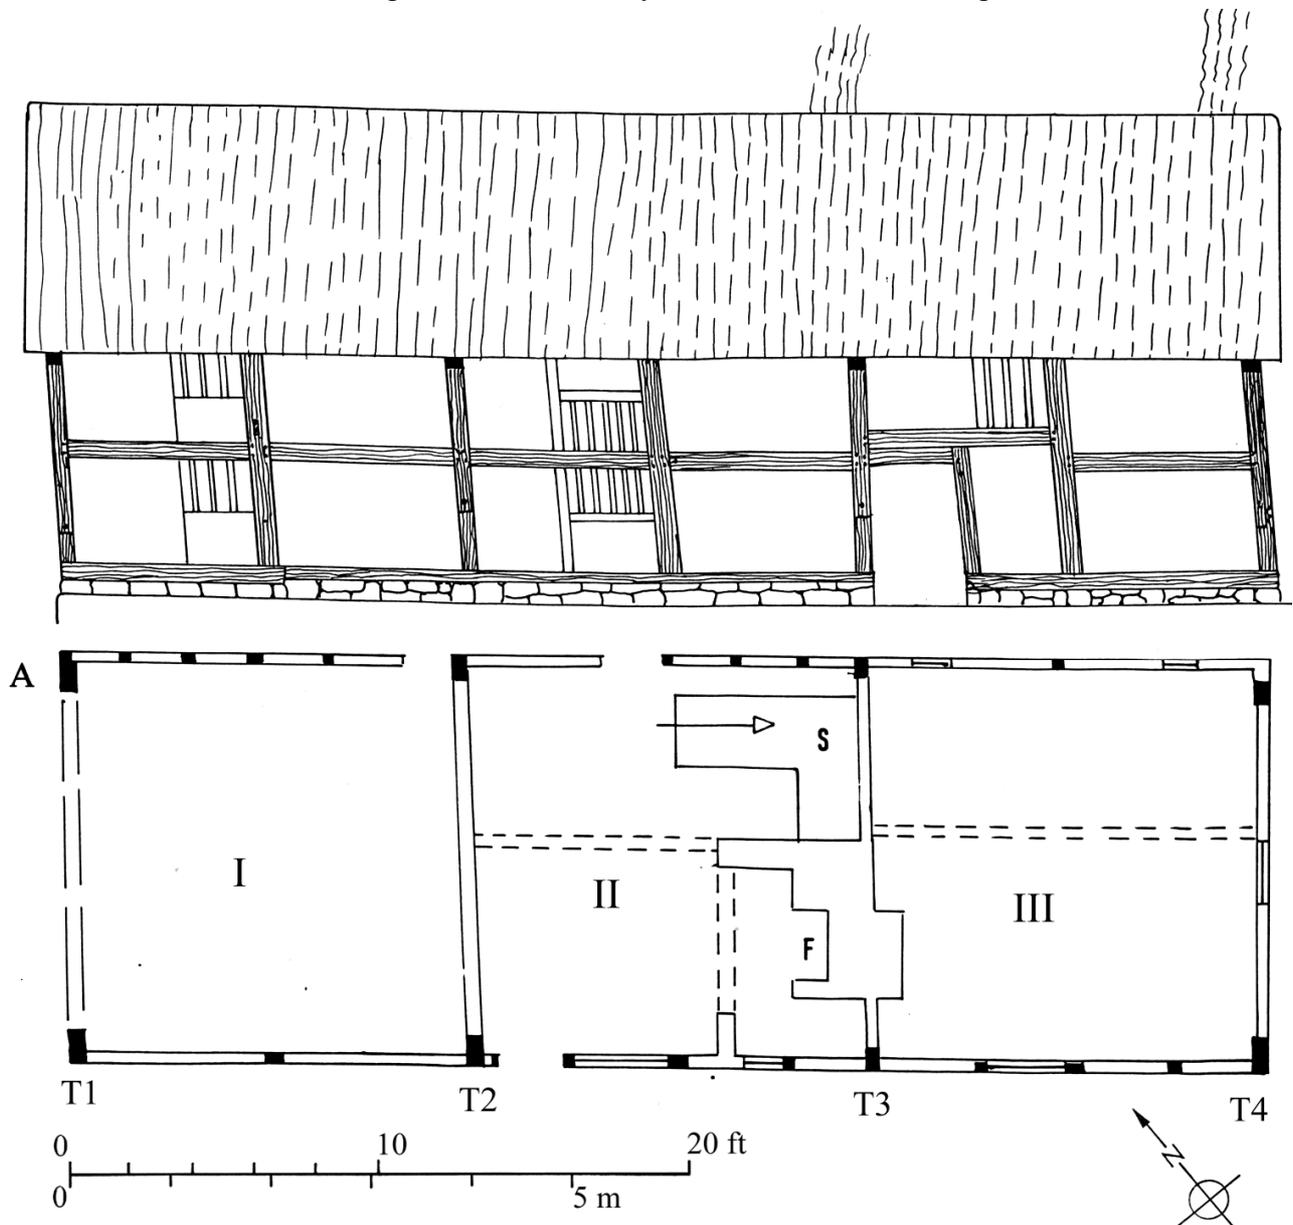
Ground floor plan, showing truss and bay numbering (lower); reconstructed elevation (upper).
